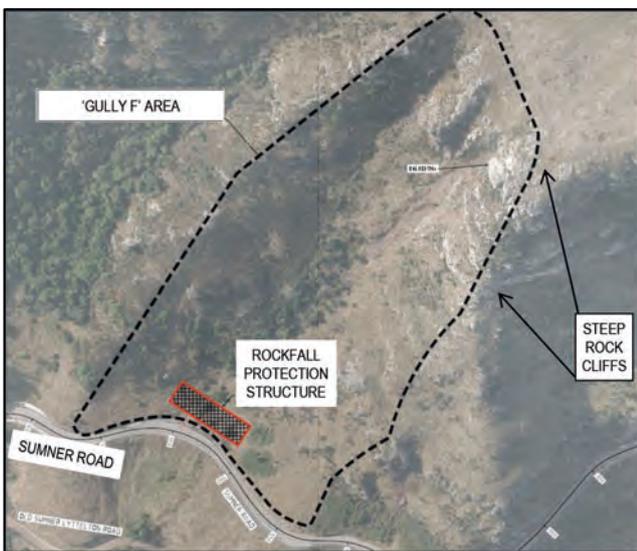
Location of rockfall protection structure above Sumner Road at 'Gully F'
